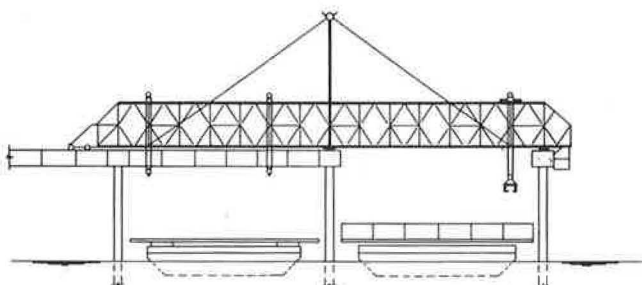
Seven Mile Bridge: span-by-span (over water) precast concrete box-girder construction with overhead trusses.
